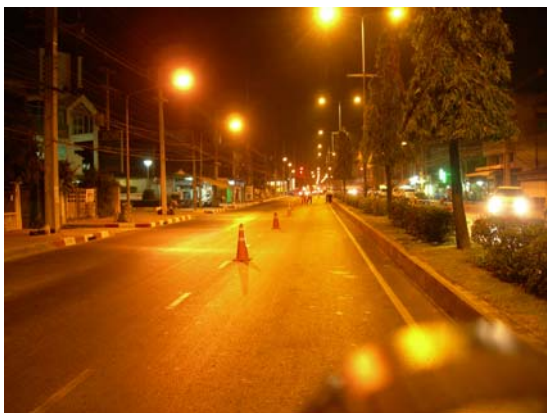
Test site for HPS 150W road lighting for C2 class with R3 road surface
